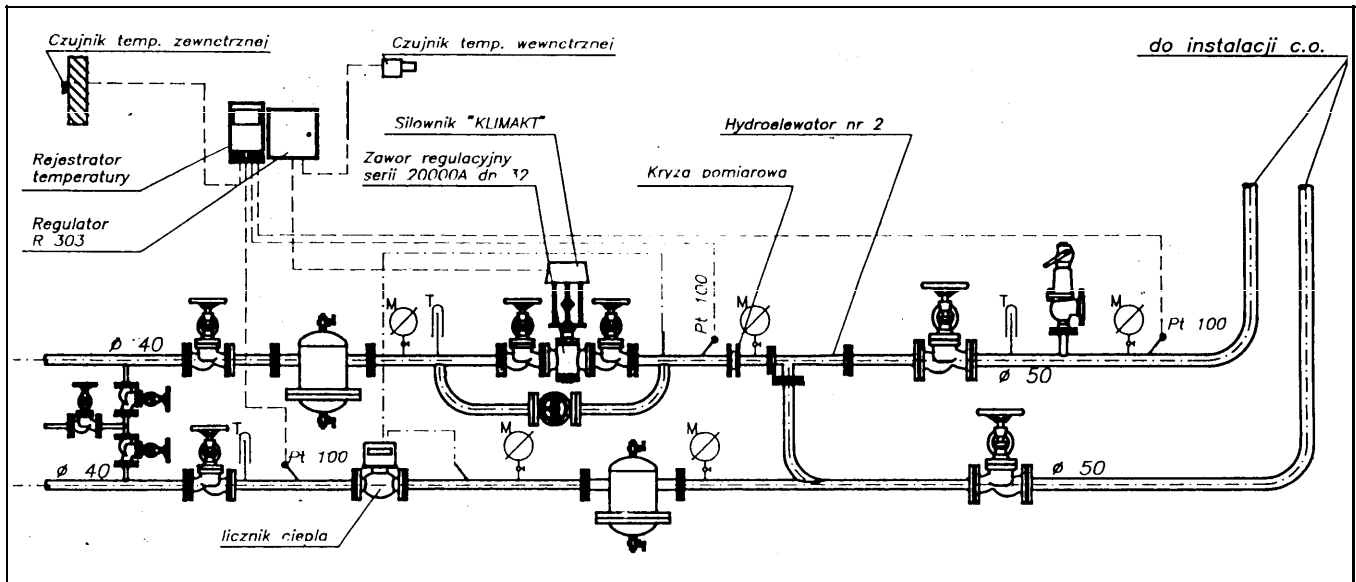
Hydro-Elevator Plumbing Arrangement at Building—District Heat Interface
